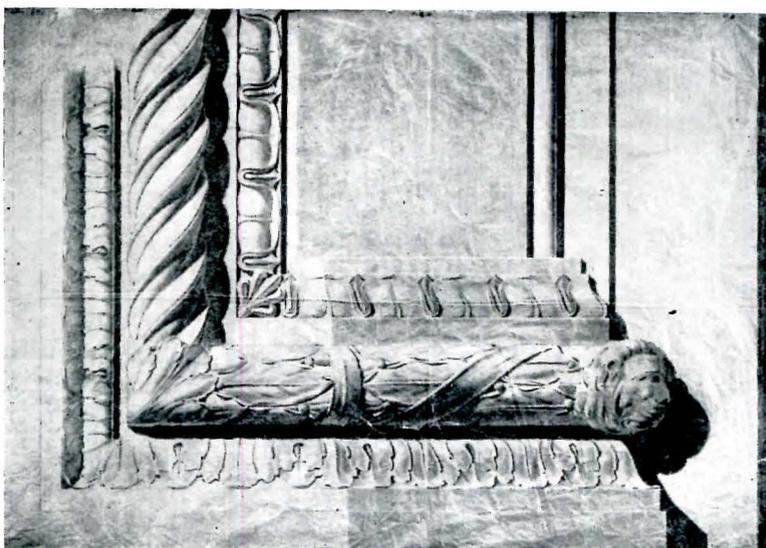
Detail of Entrance Door Architrave, Leader Building, Cleveland, O., Charles A. Platt, Architect.
